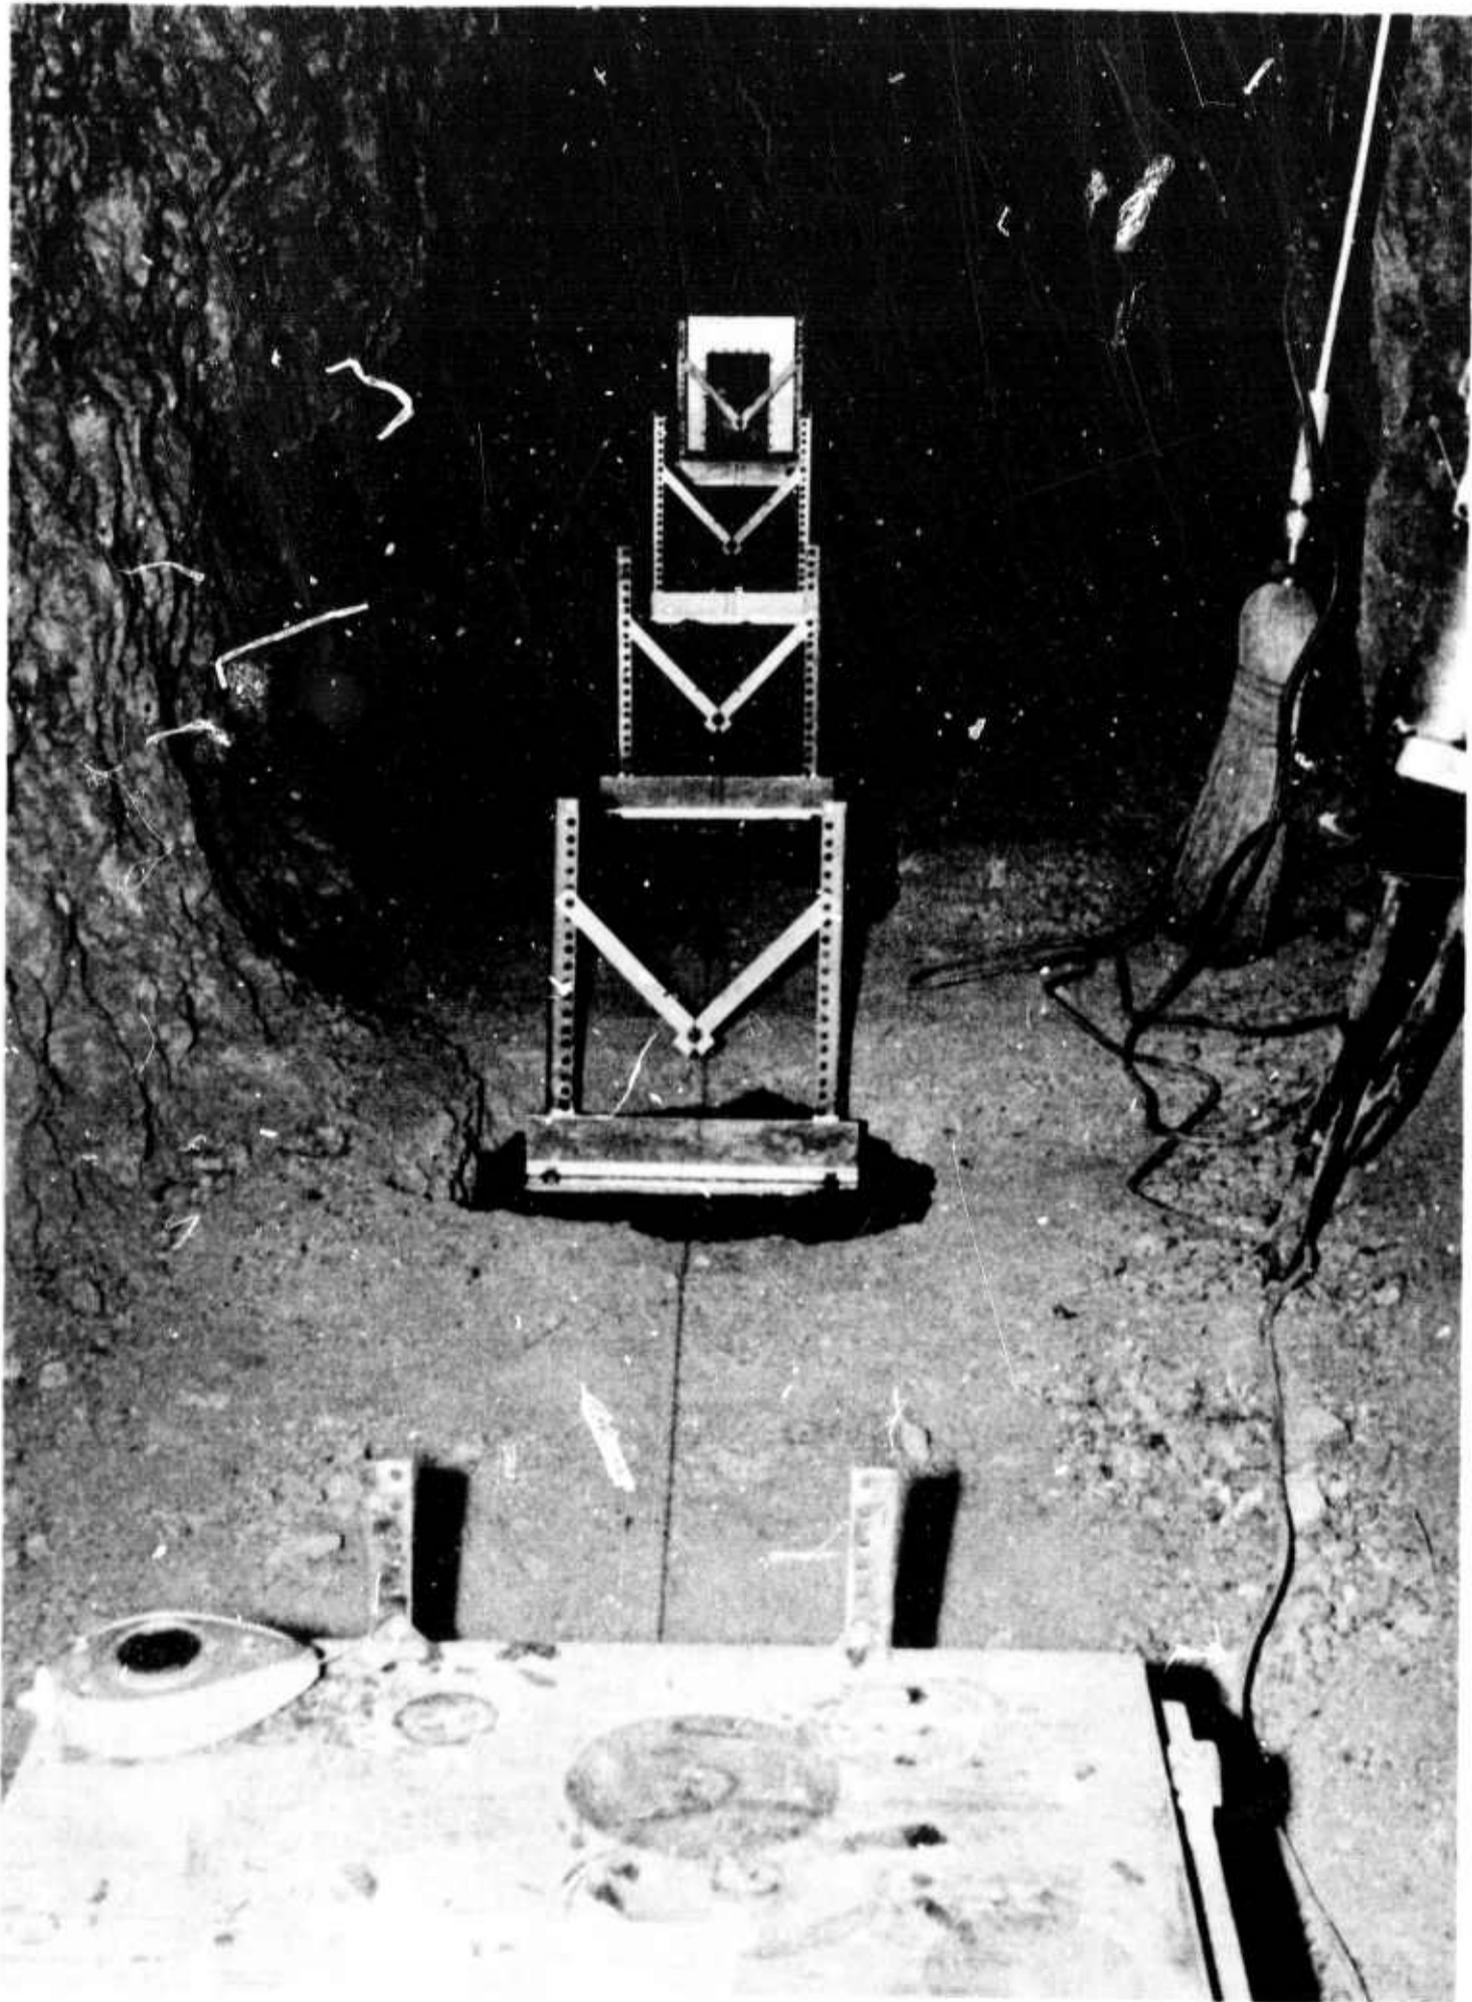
View of mine tunnel installation at Site No. 1 (RH-NV).
